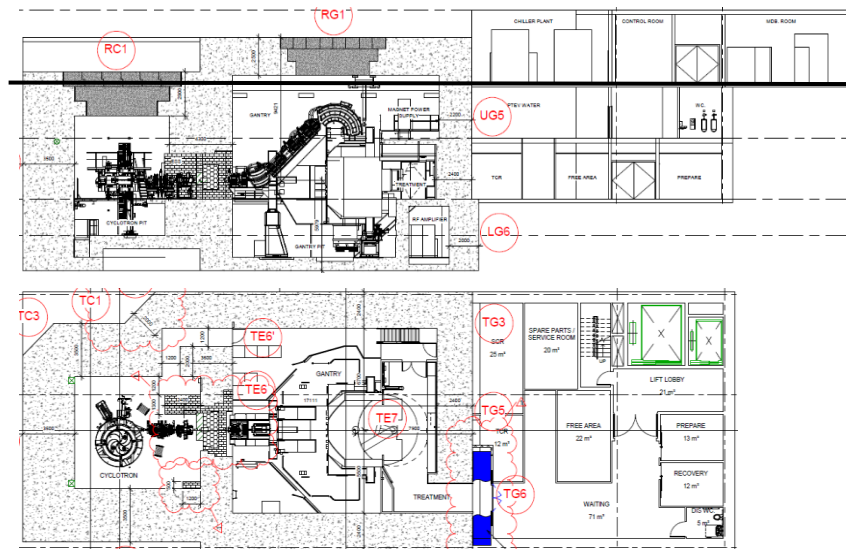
The layout of our center. Building section (Top). Treatment floor (Bottom)
